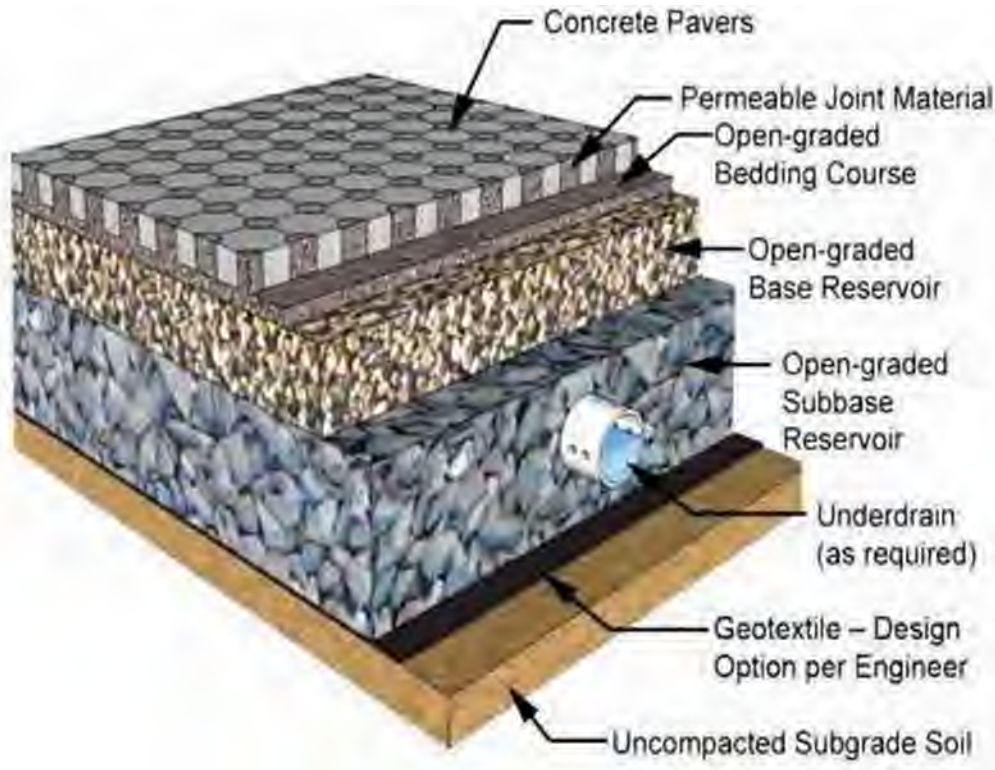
Cross-section of permeable pavement (source: ICPI).
